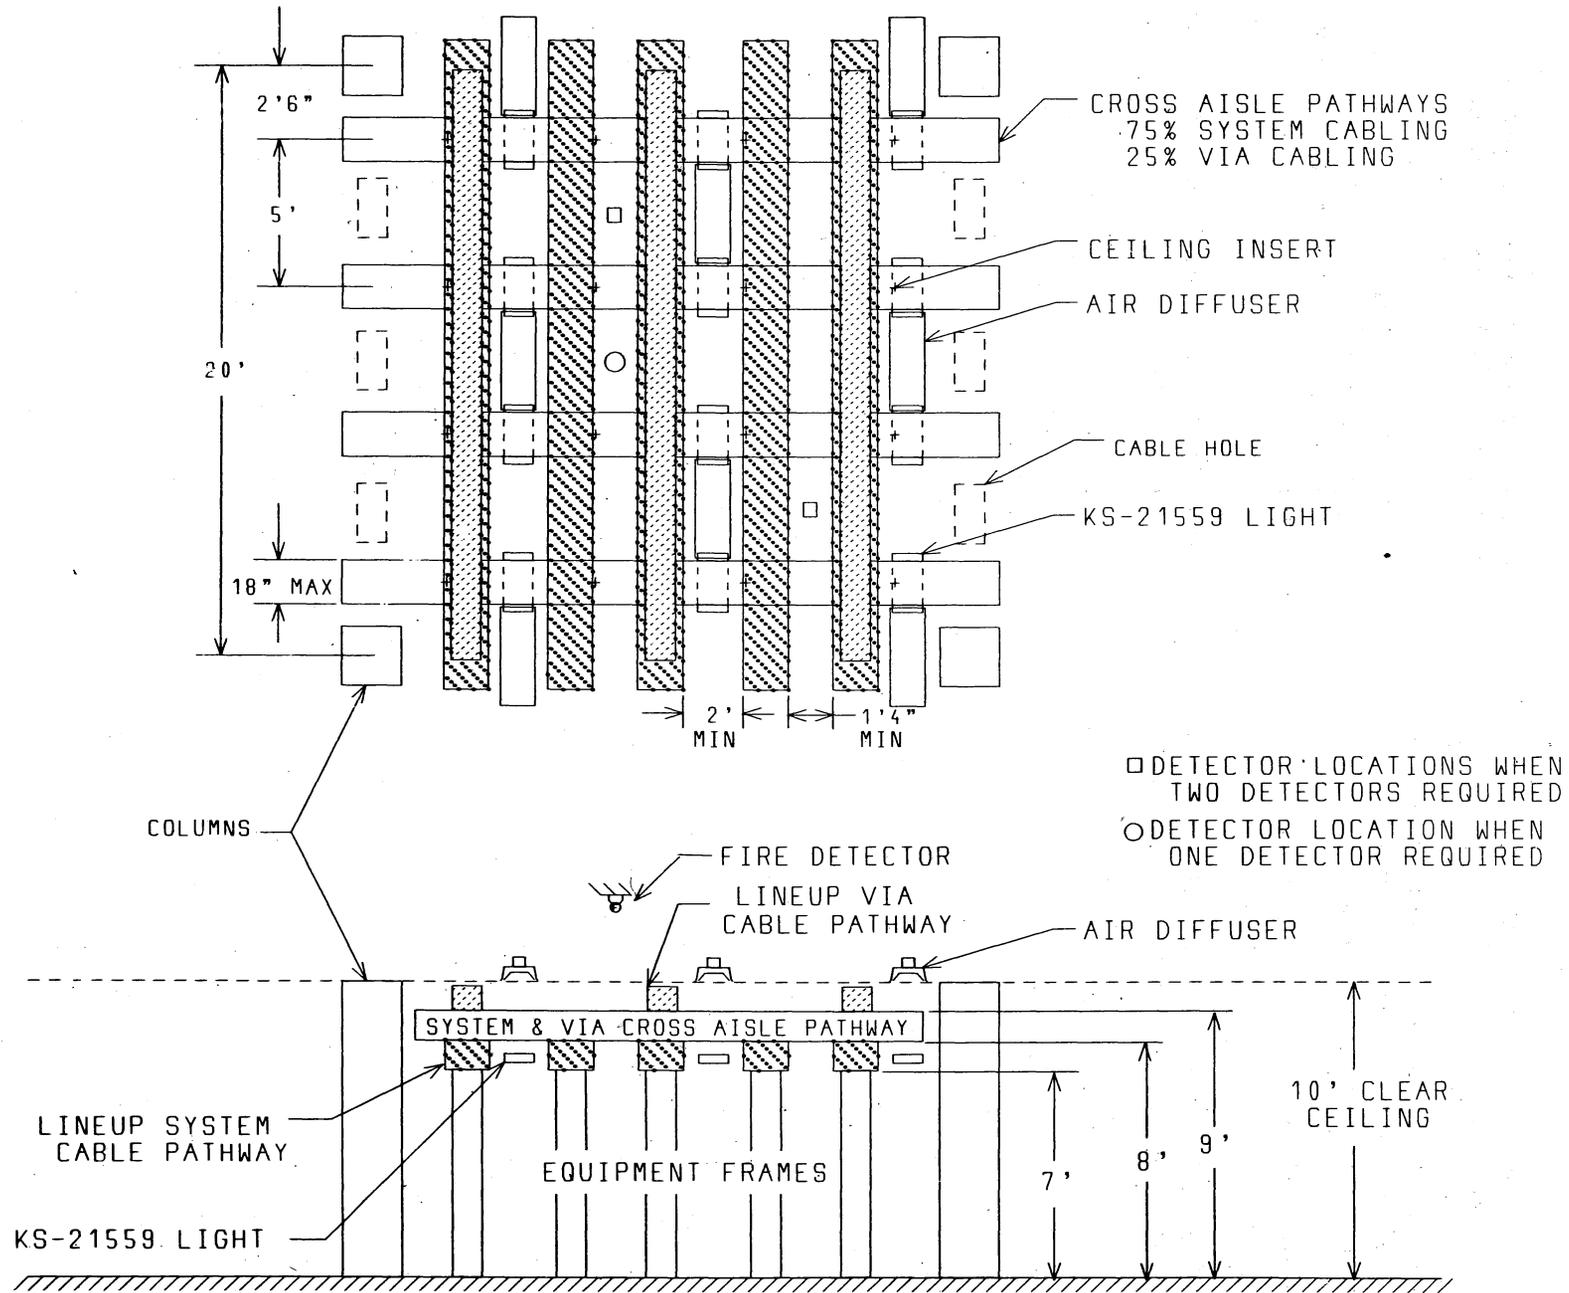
Cable Pathways Plan for 12-Inch Deep Frame Areas
